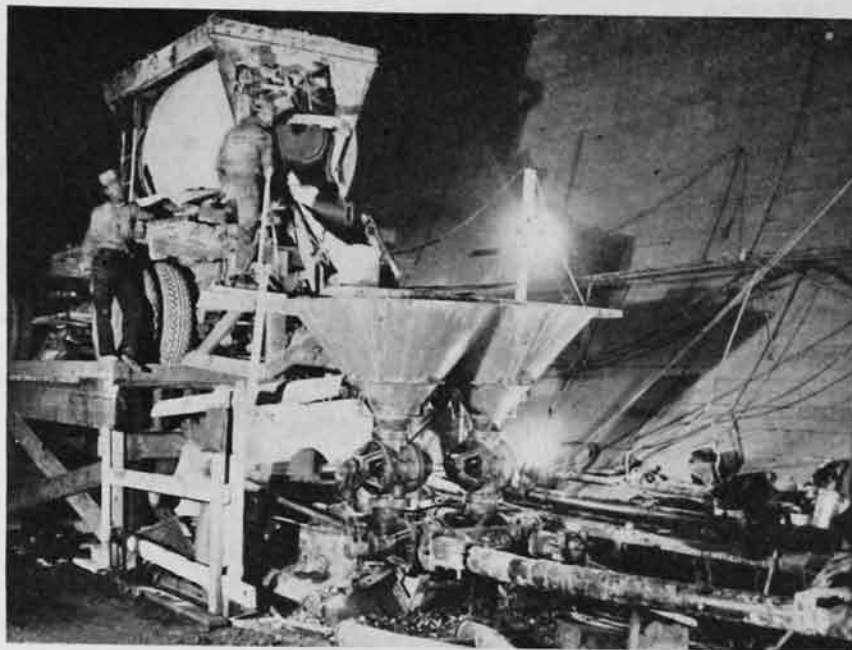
The concrete pump is a new type of equipment in use at Boulder Dam. Rig shown here placed lining in riser shafts leading to canyon-wall outlets from inner diversion tunnels. Concrete for lining inclined penstock tunnels is now being pumped from lower portals.
